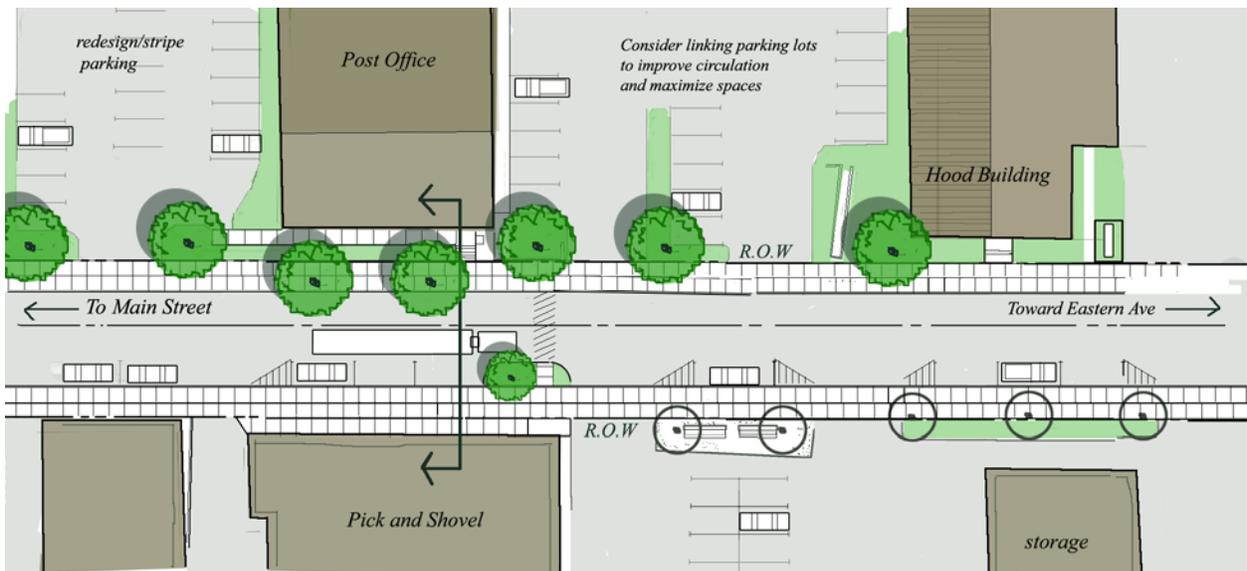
COVENTRY PLAN WITH PARKING ON WEST SIDE ONLY
